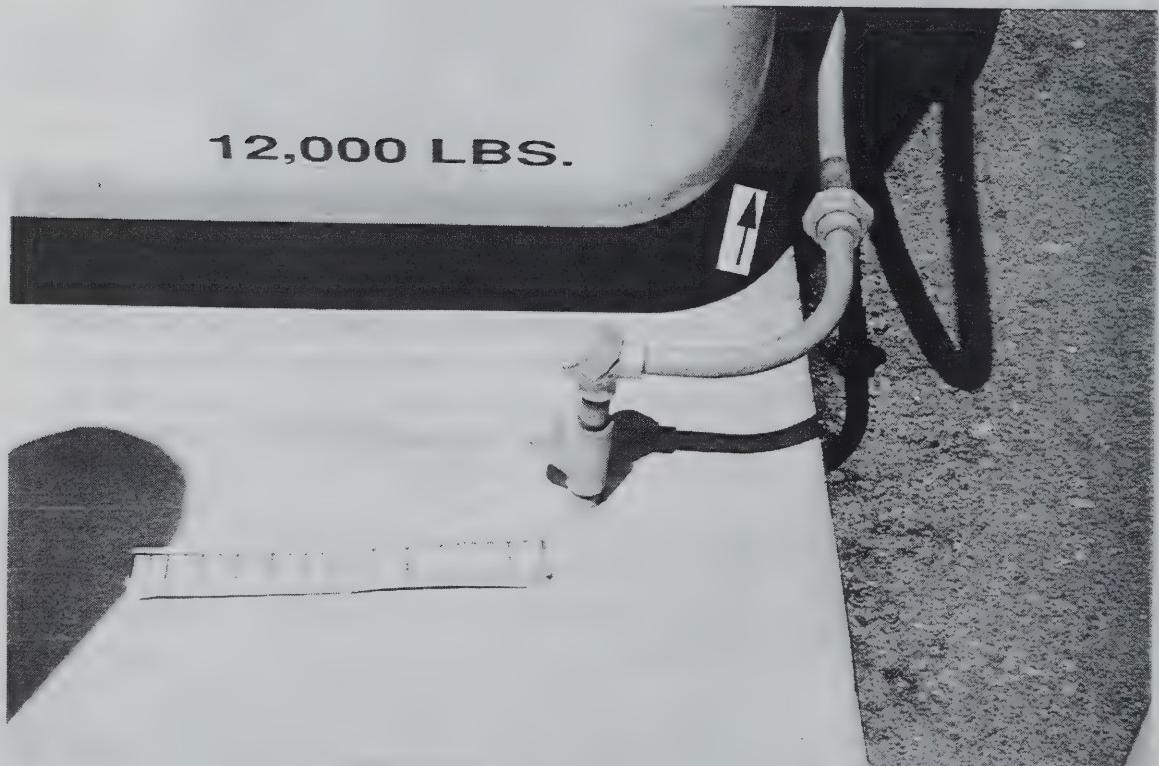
Note that anchor tabs are not used and if the tank slides it could damage the connection.
